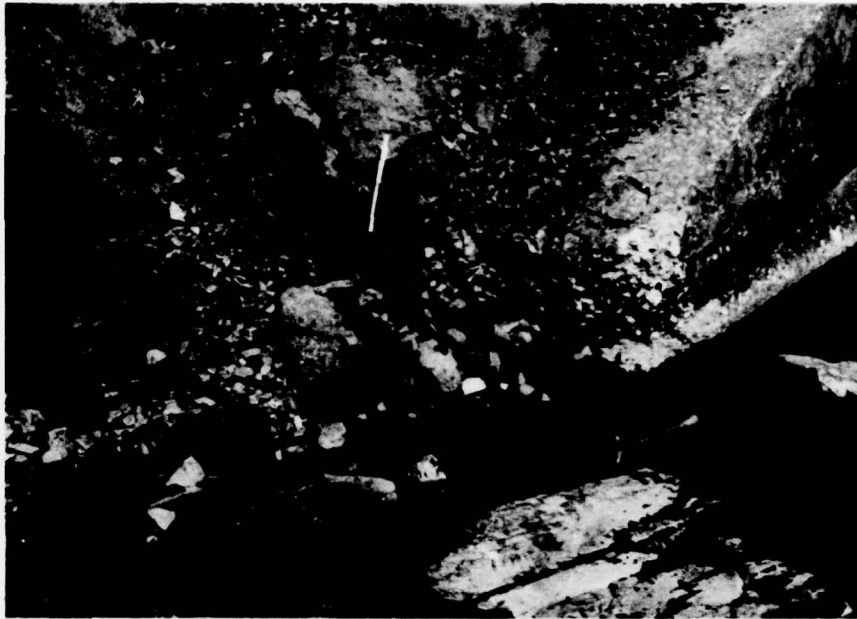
Detail of toe of right wingwall showing minor embankment seepage.
